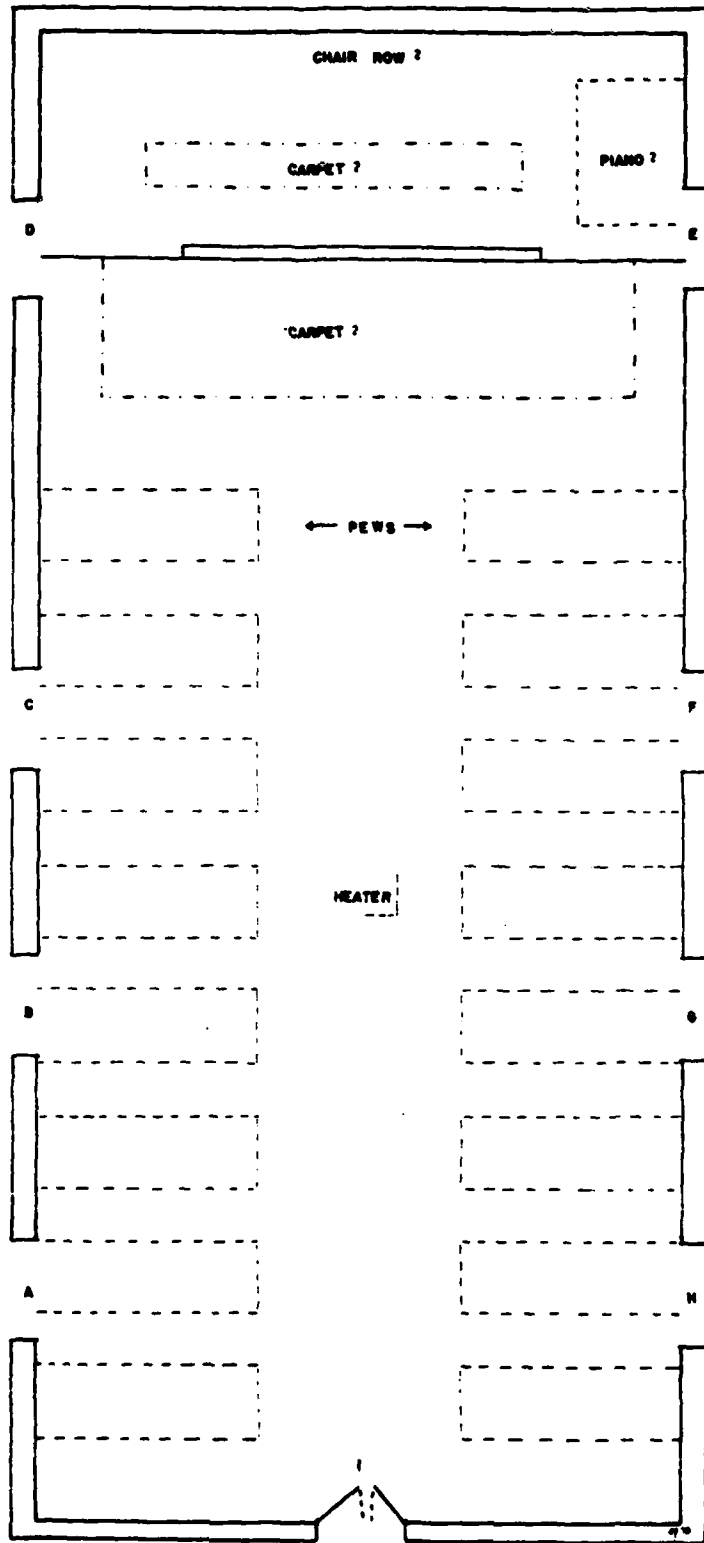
Floor plan of Carter Chapel, Tract 914.
